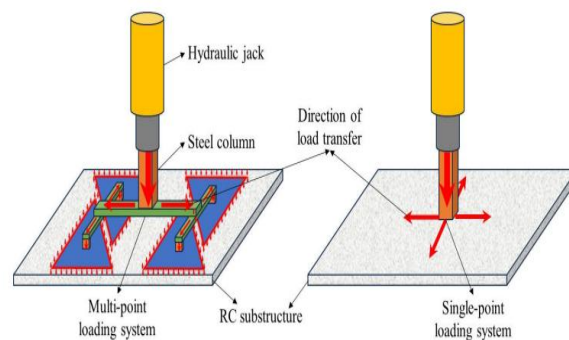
Loading device for quasi-static testing of flat slab column structures.
